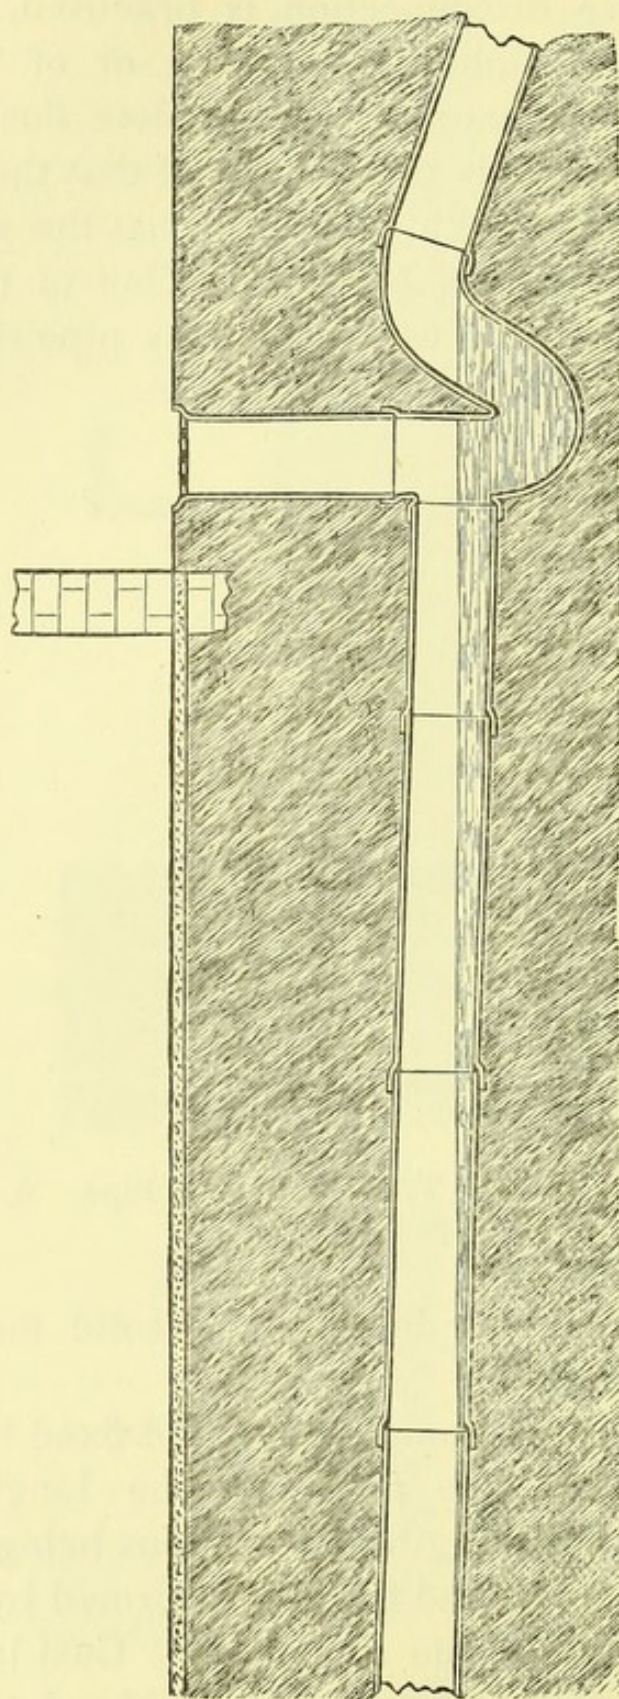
Disconnection Trap with outlet higher than the inlet.
